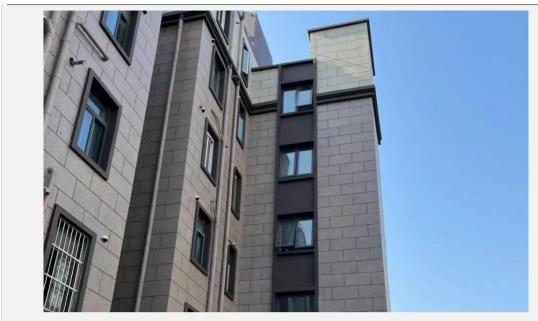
Elevator addition project of the Huting Yuan (Estate)
